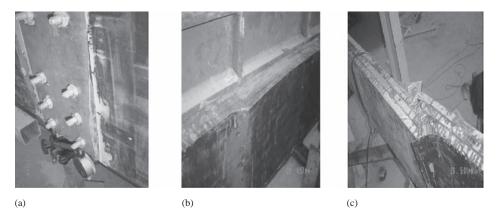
Failure patterns for bamboo girder specimens: (a) Beam-1; (b) Beam-2; and (c) Beam-3.
